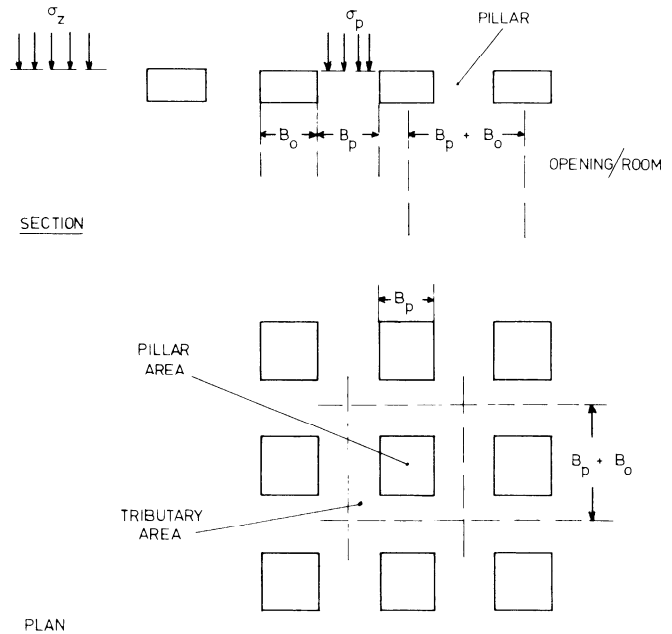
Section and plans of rooms and pillars with widths and dimensions for simple analysis.
